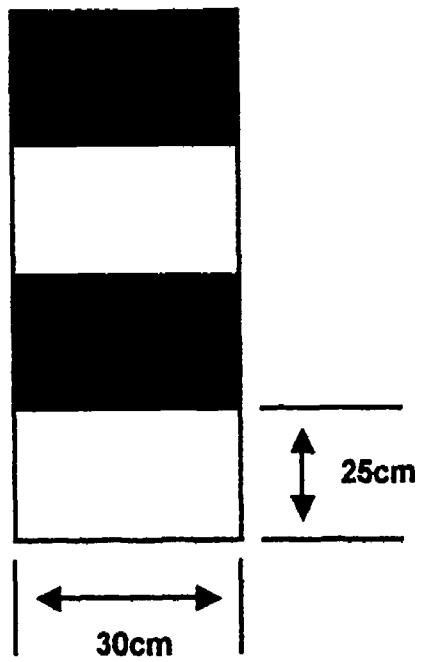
HORIZONTAL COVER BOARD SPECIFICATIONS
